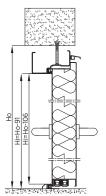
Installation of the ECO Tech single-leaf seamless door with an internal frame without a thermal break to a masonry wall – horizontal cross-section
